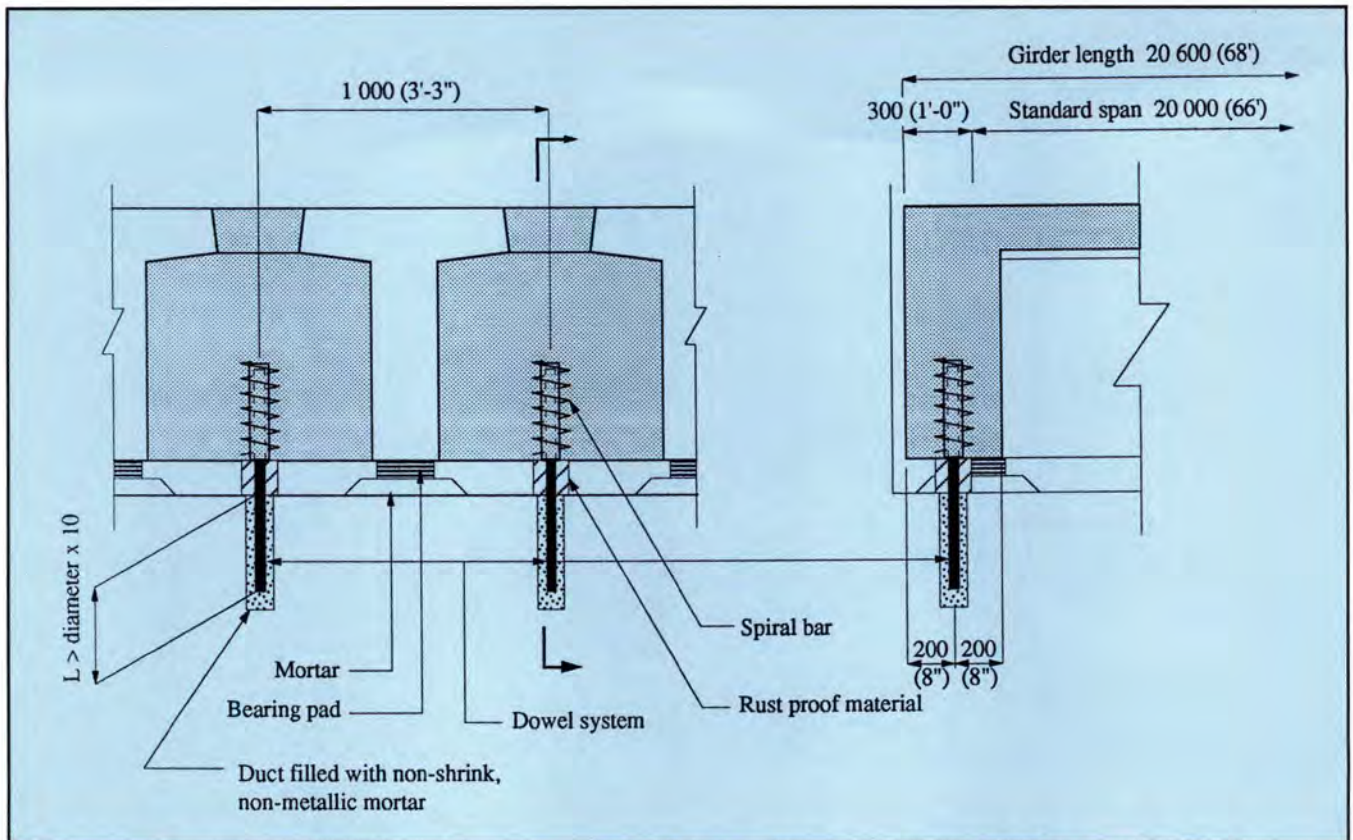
Bearing and seismic dowel details for a pretensioned T-girder bridge [span of 20 m (66 ft) for TL-20 loading].
